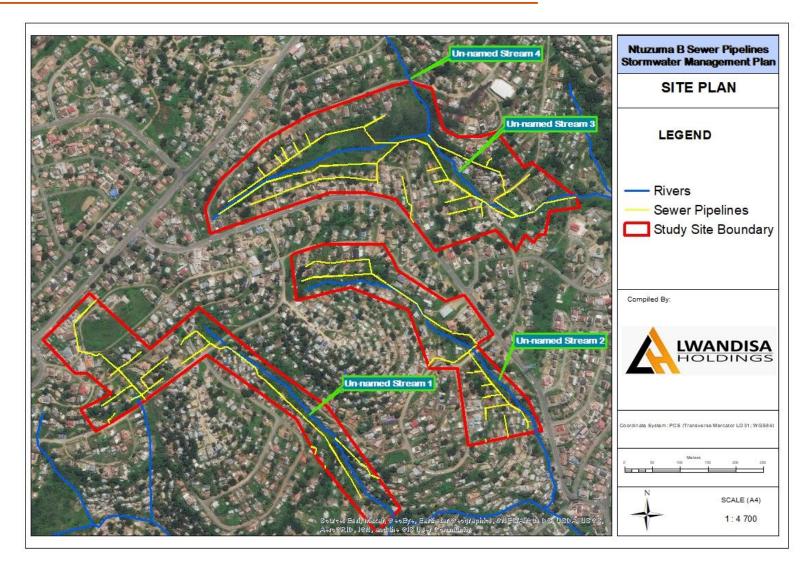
Site Plan of the Ntuzuma B Sewer Pipelines Project
